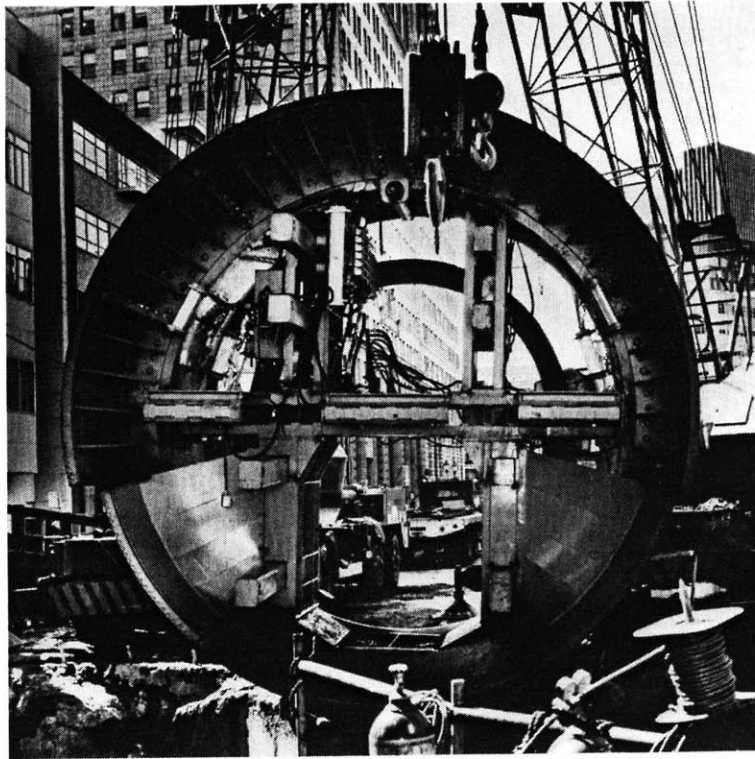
Open-faced shield used in Trans-Bay tube project (1969)
